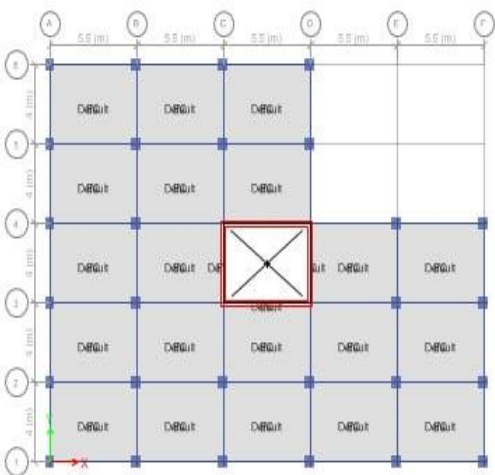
4 G+5 Irregular building with Shear wall location at the center
